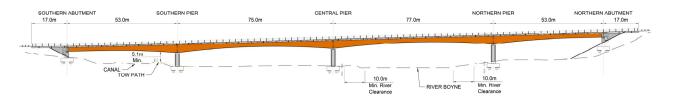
Overview of Proposed Span Arrangement of the River Boyne Bridge
